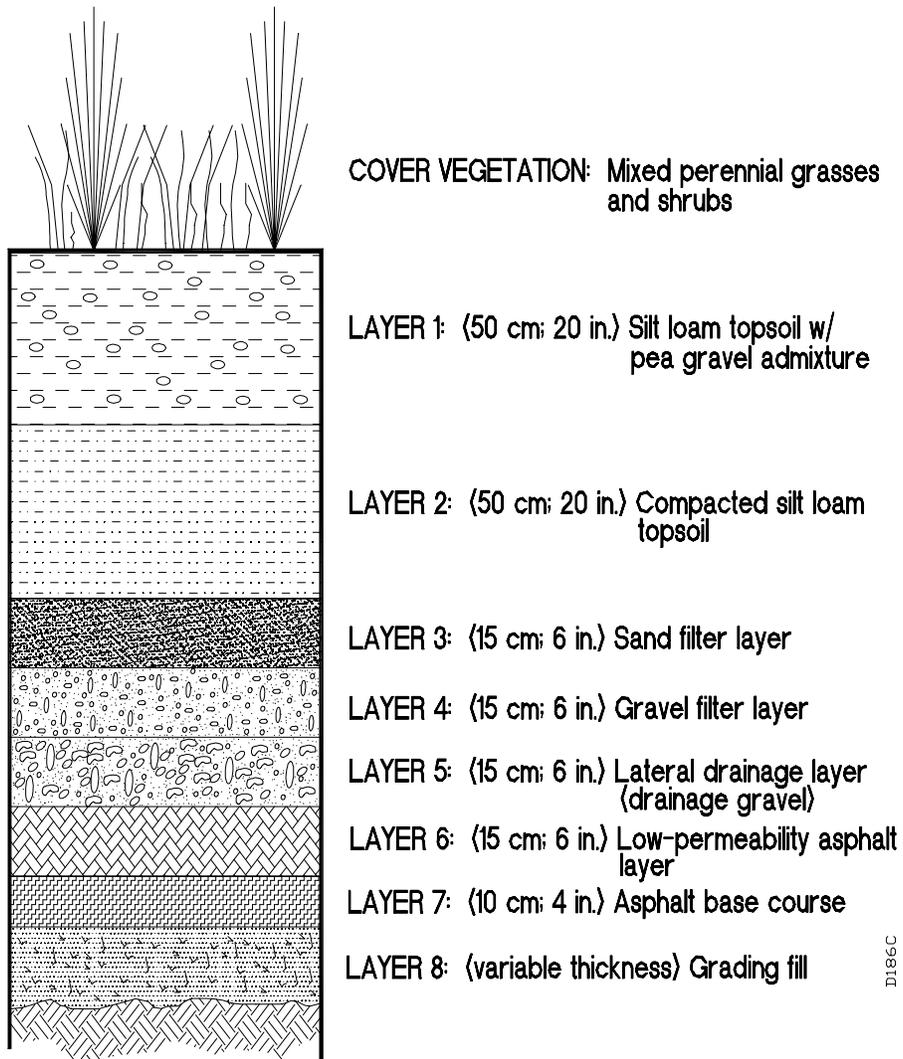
Cross-Sectional Elevation View of Proposed ILAW Product Disposal Facilities
